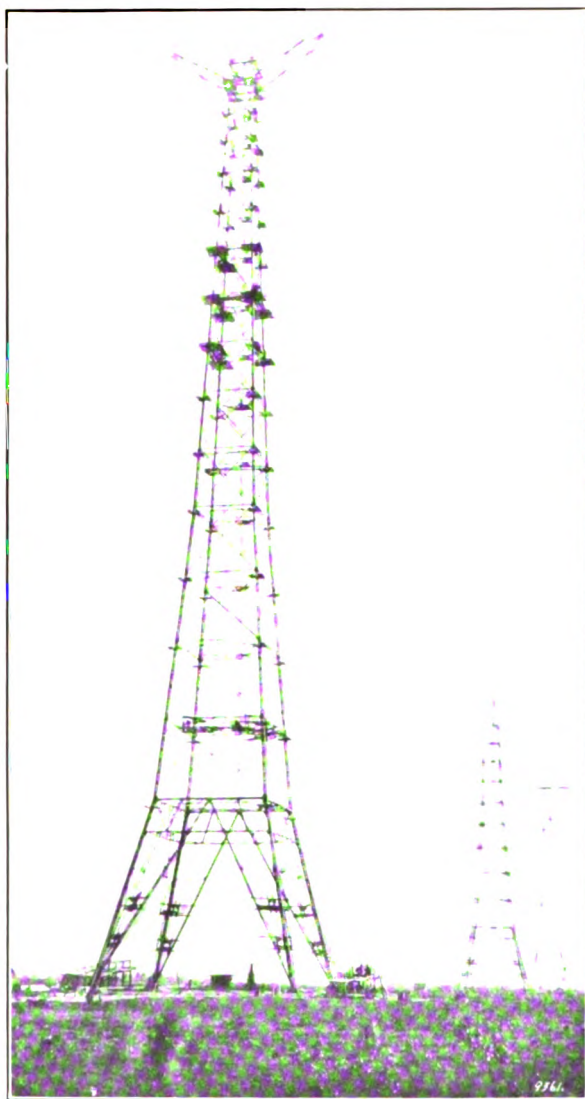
Three of the Towers in Construction Showing Cranes for Hoisting 75-foot Cross-arm Sections
